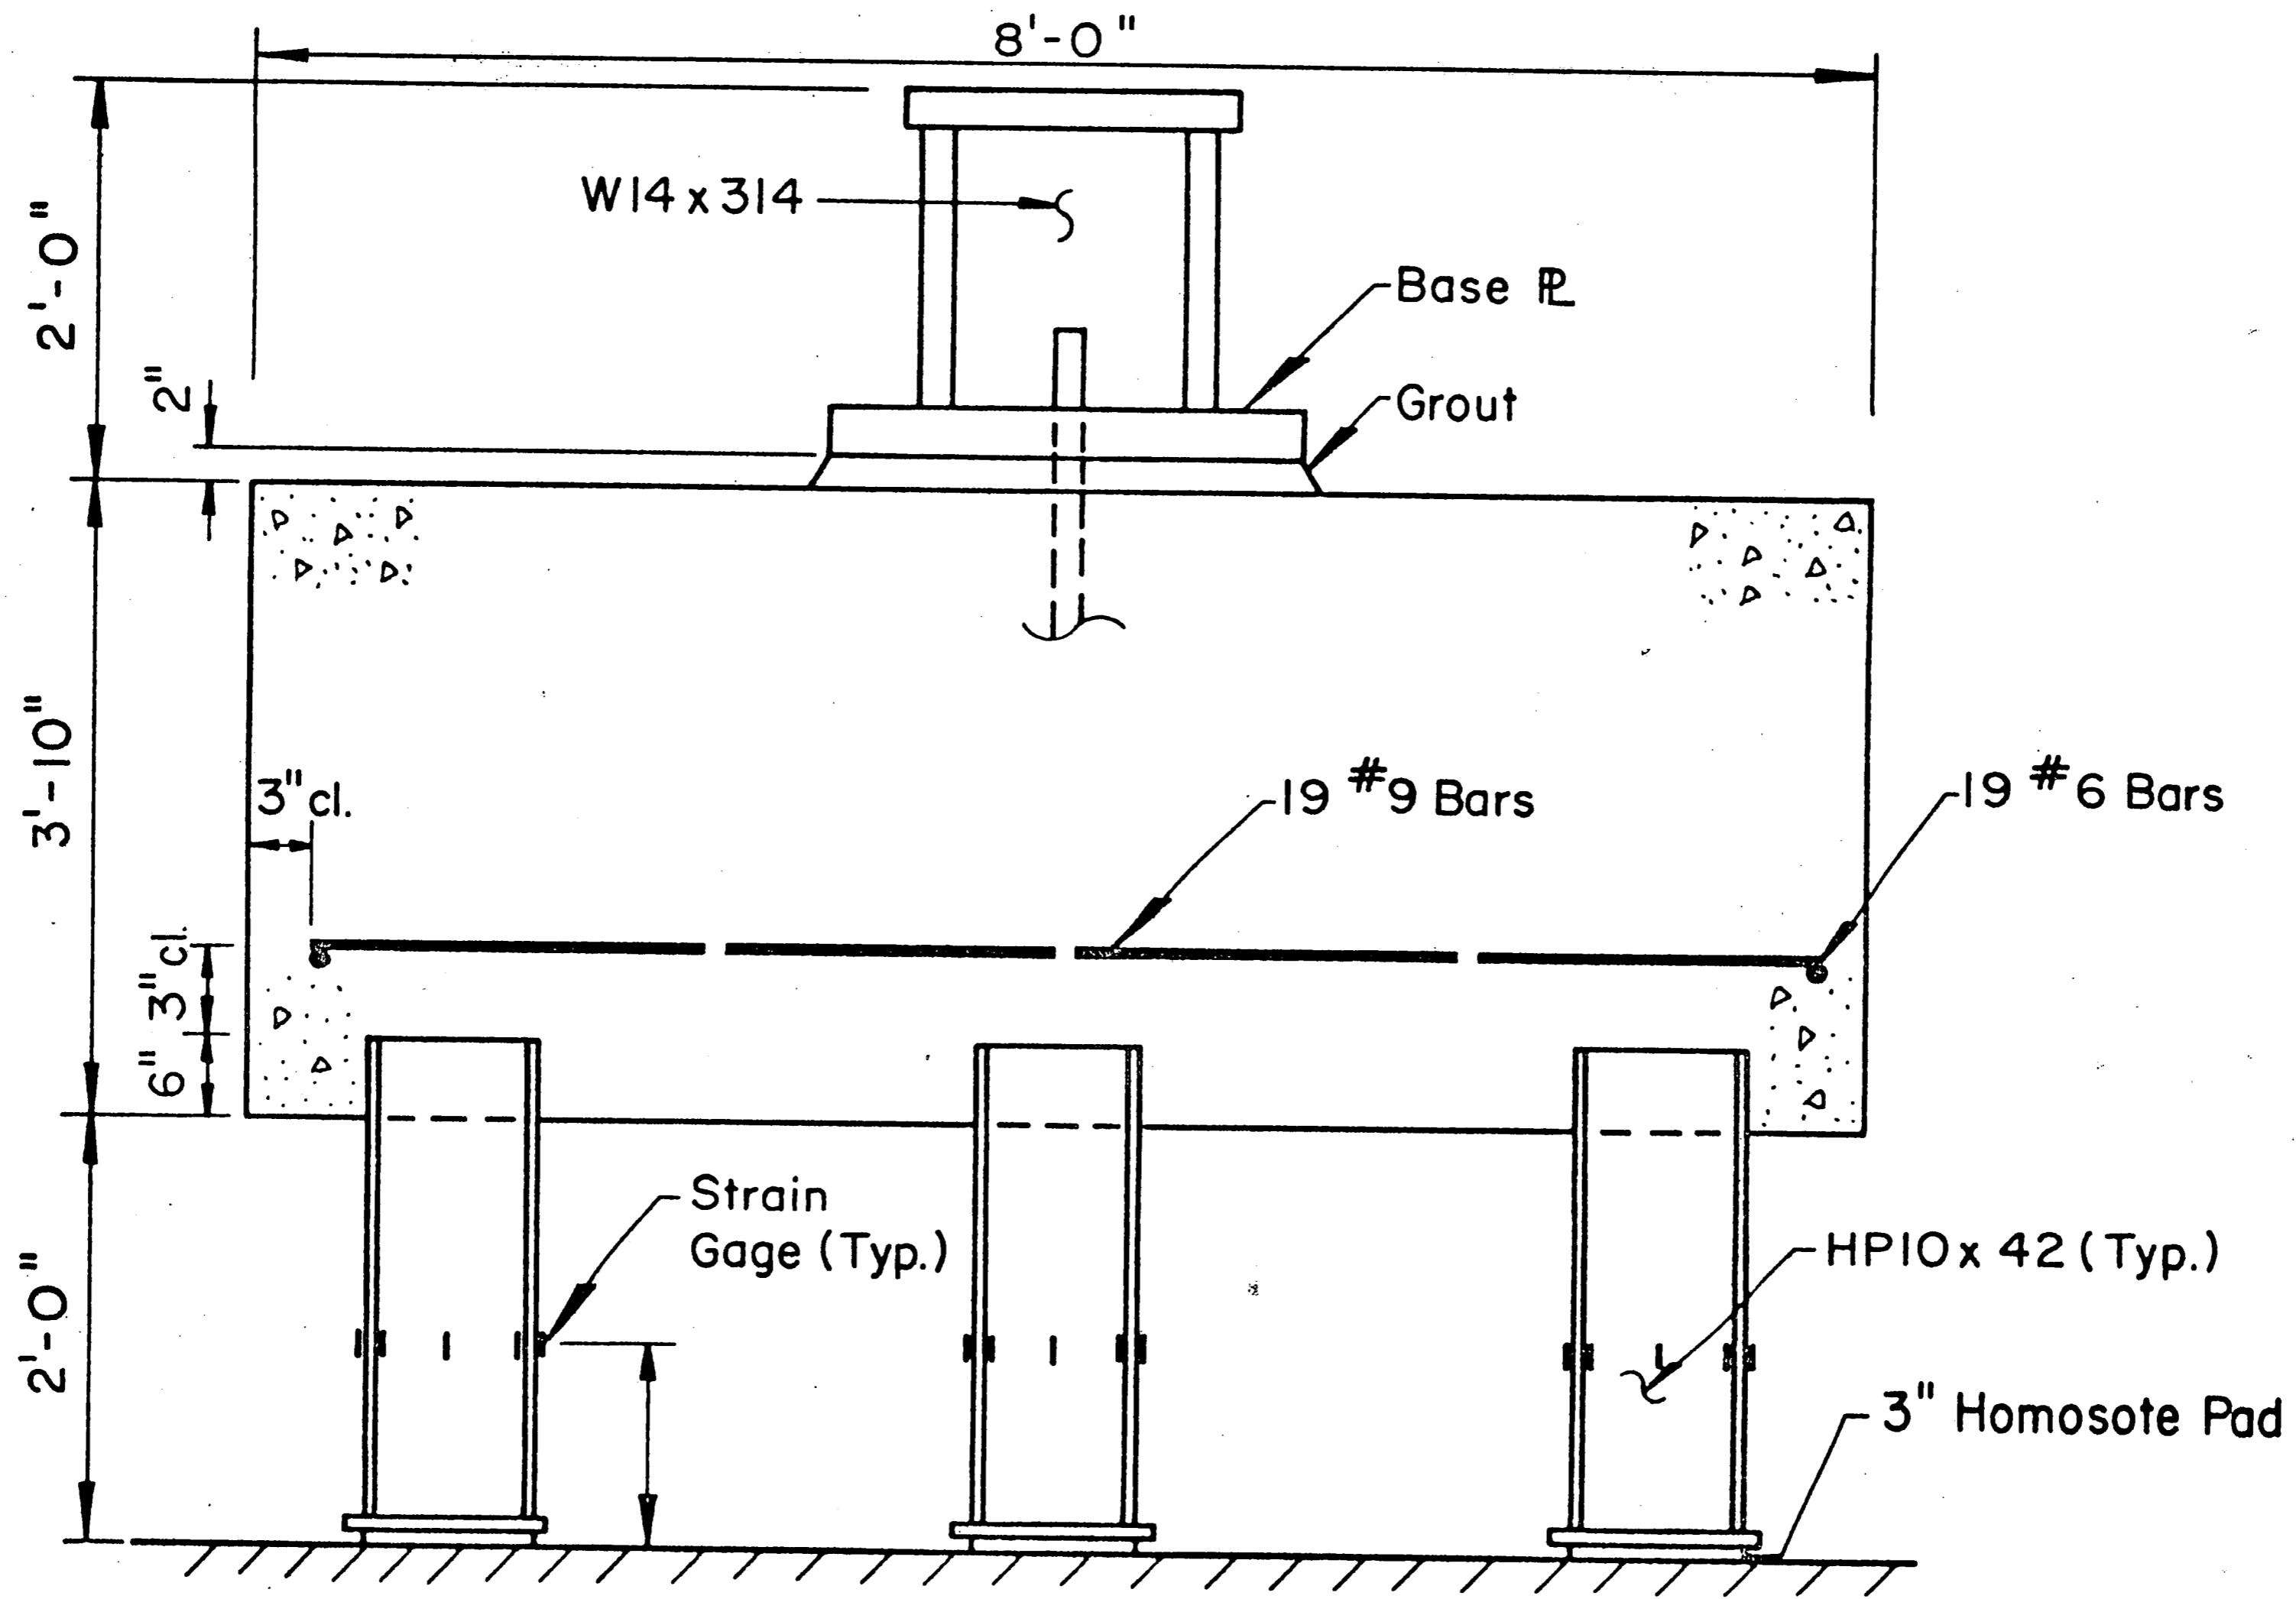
PILE CAP 2 - SOUTH ELEVATION
